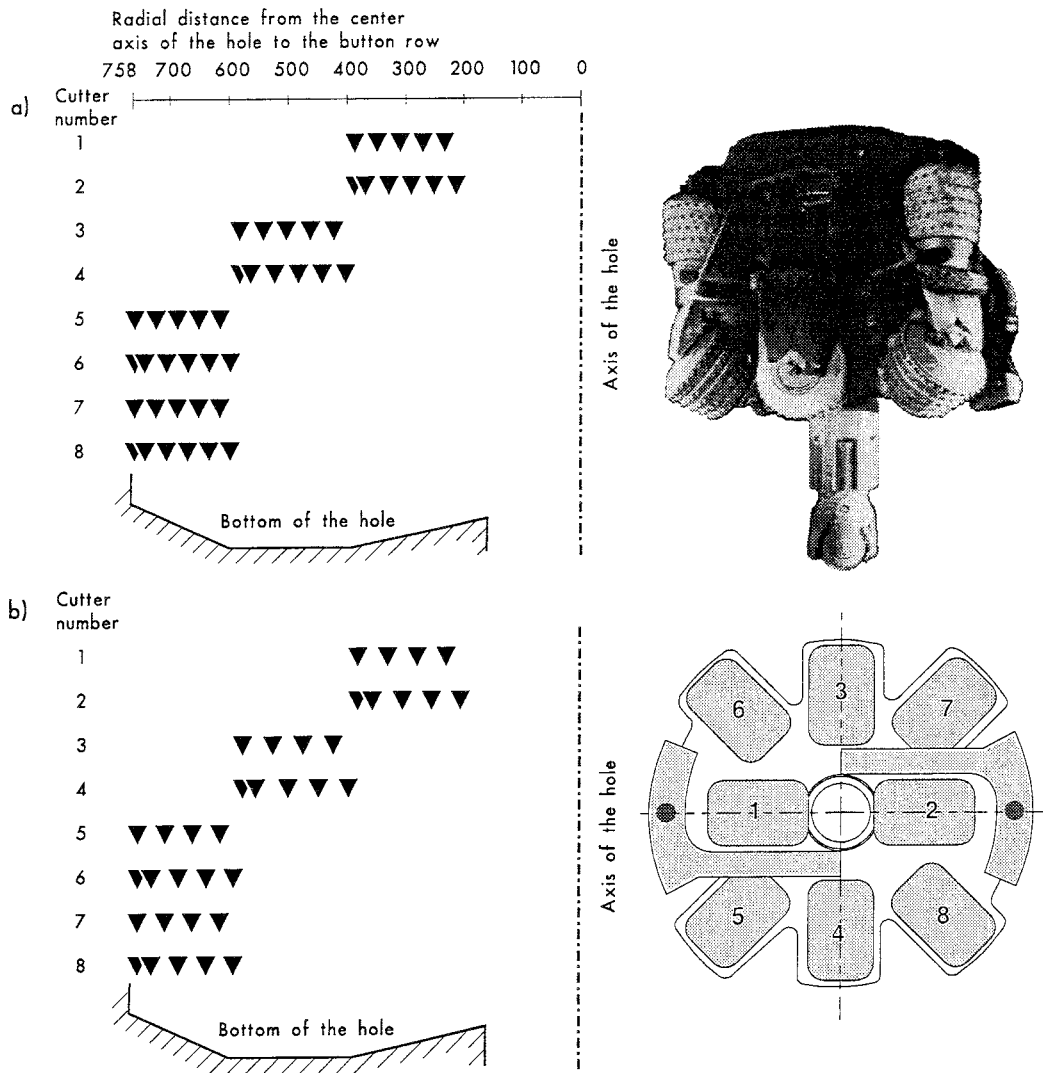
Positioning of button rows in the cutters. The cutter head was furnished with cutters of type a) CMR-41 & -52, b) CMR-55 & -66.
